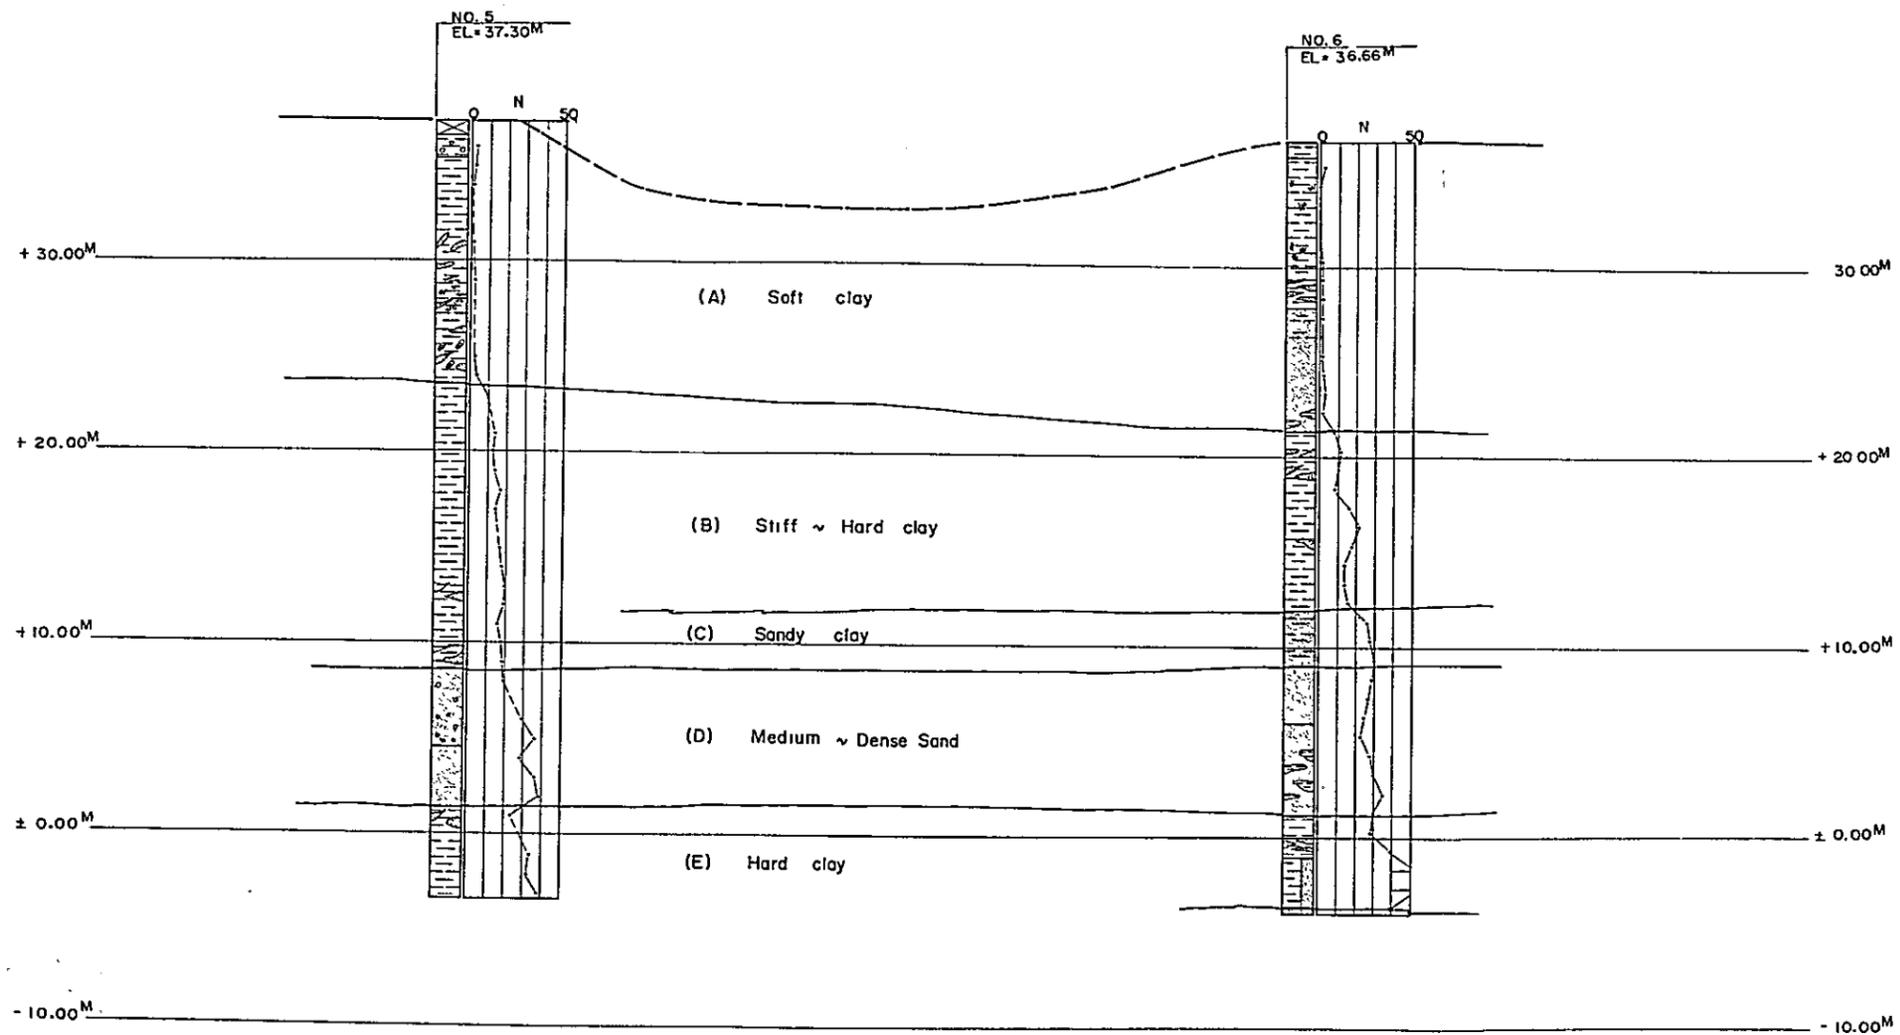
SOIL PROFILE OF BANGKOK-NOI BRIDGE
